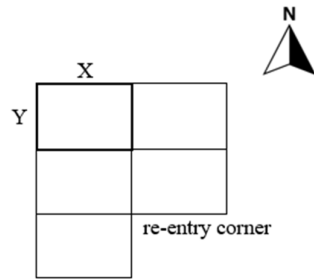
Design where the re-entry corner is considered based on the structure's orientation to the sun.
